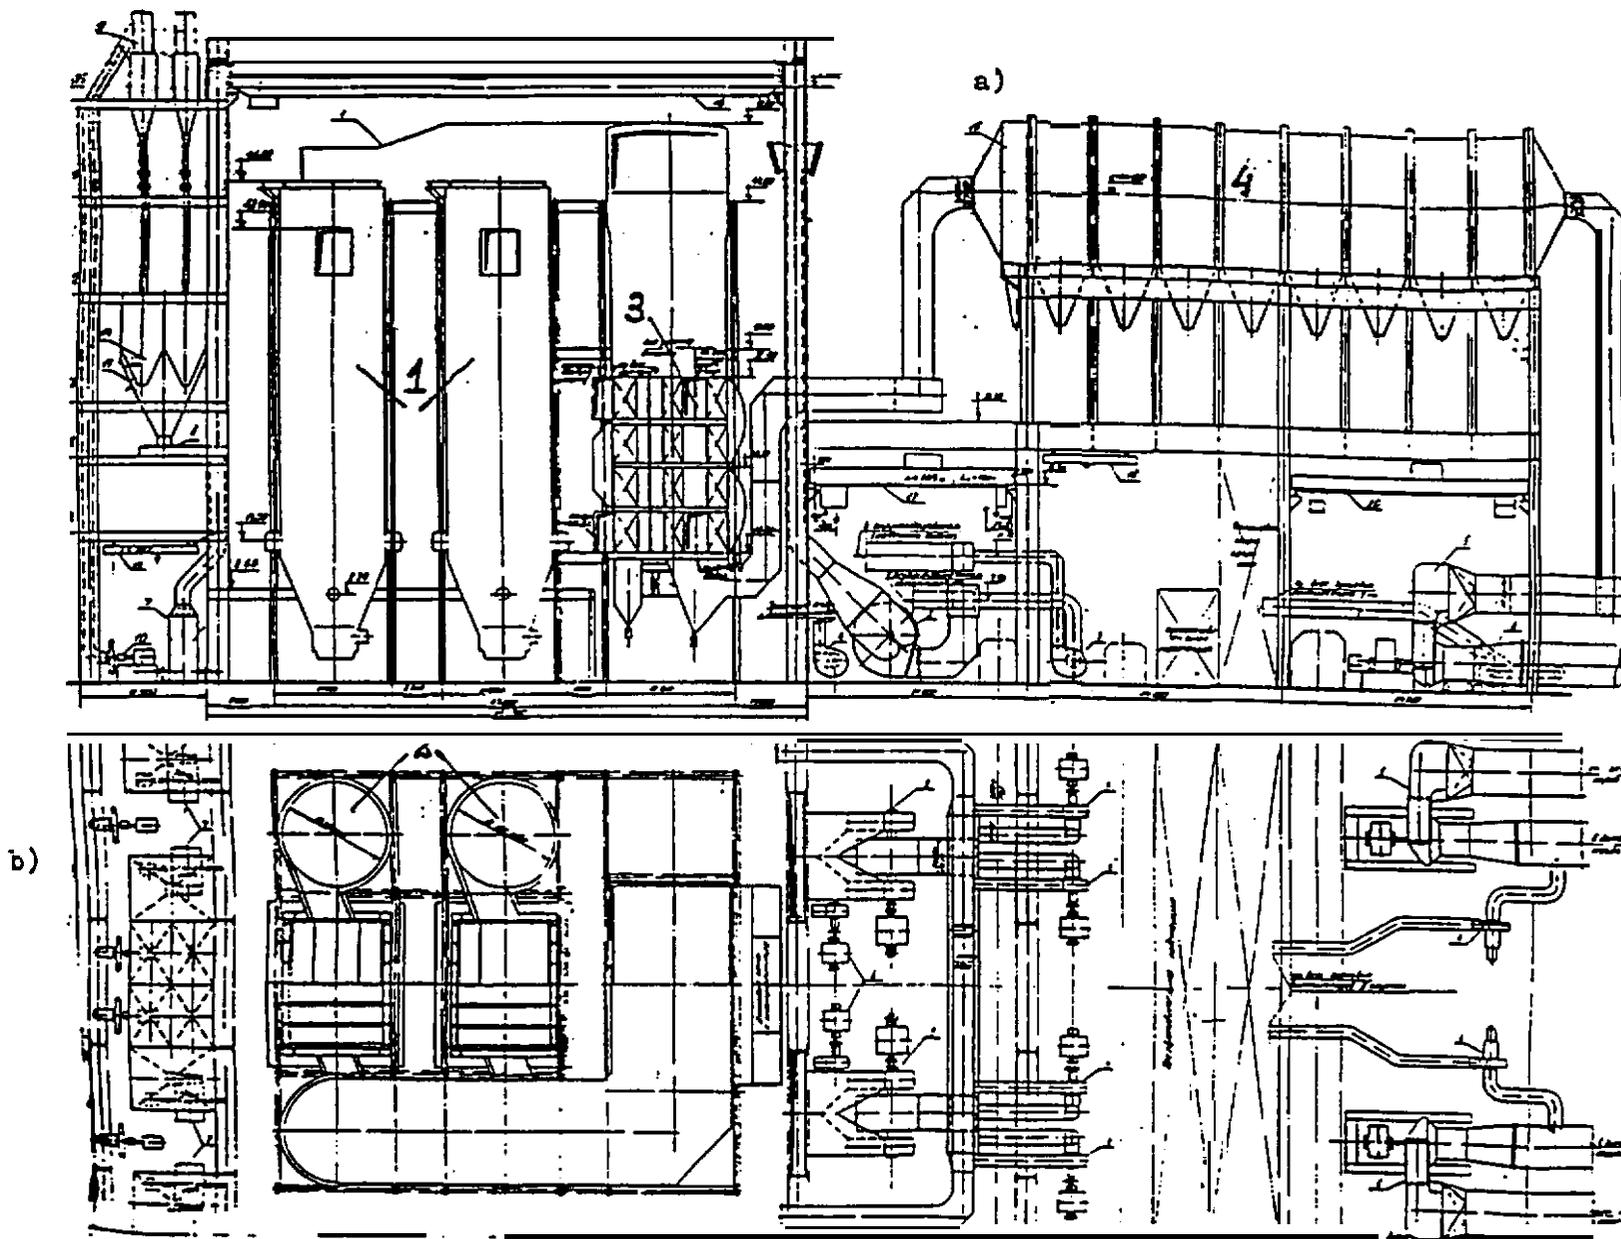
CFB boiler installation: a) cross-section, b) layout
